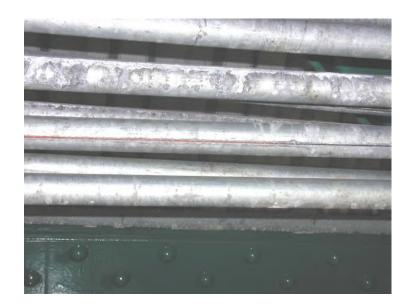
Conduit, Span 1 – note longitudinal crack/split
